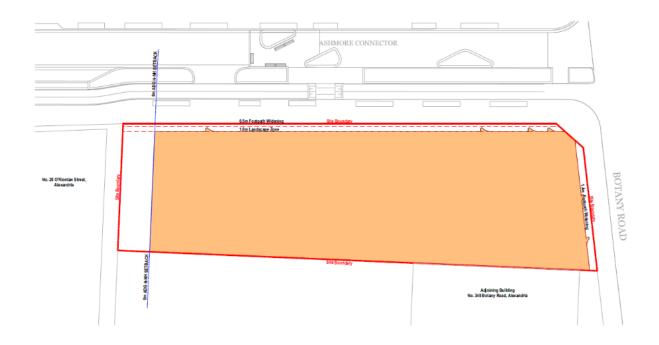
Proposed envelope plans - Levels 4 - 7 (Note: proposed blade projections above ground level over setbacks)
